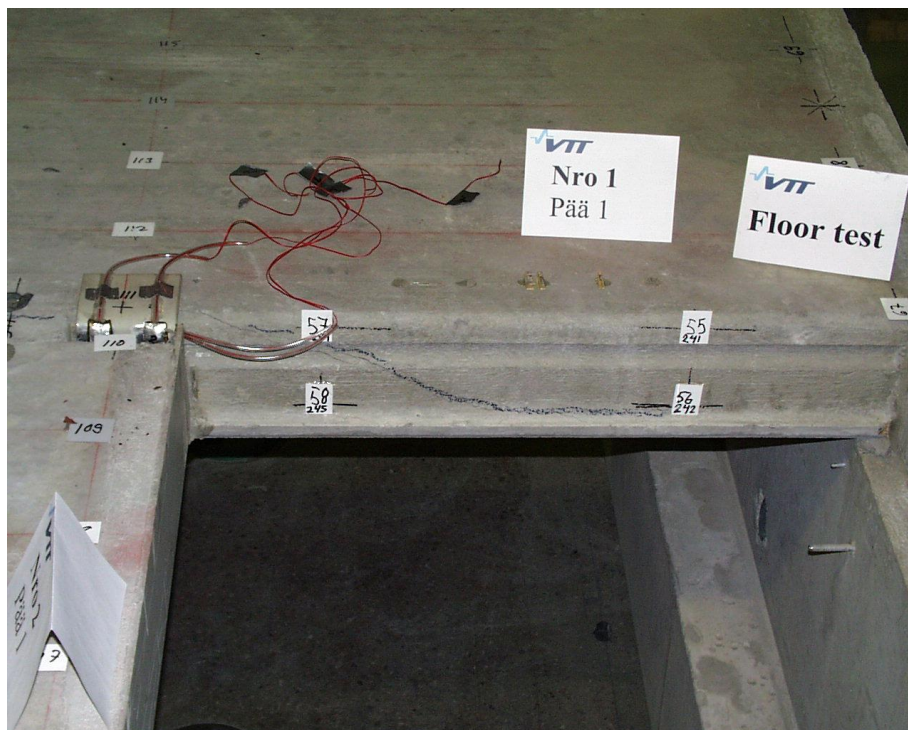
FT200:12. Cracks on edge of slab 1 next to opening after failure.
